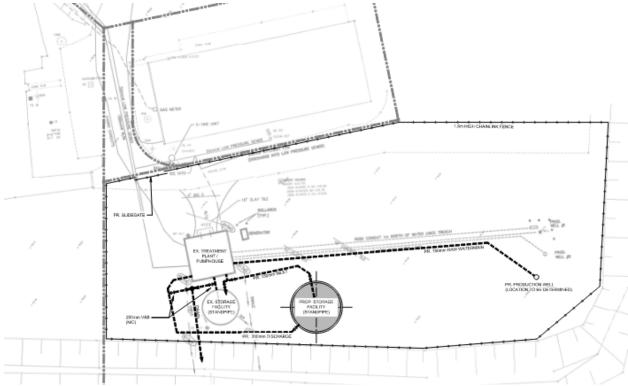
Moorefield Water Treatment Plant Site Plan
